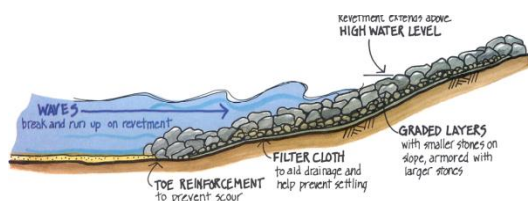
Typical revetment cross-section (USACE, St. Paul District).
